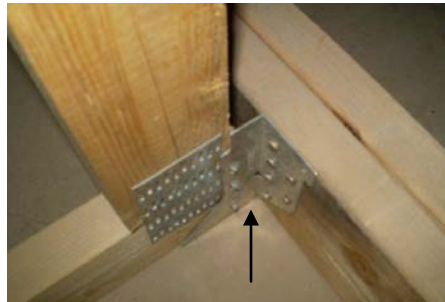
TRUSSES ARE NOT FLUSH WITH DRAG TRUSS. UNABLE TO NAIL AT BRACKET
